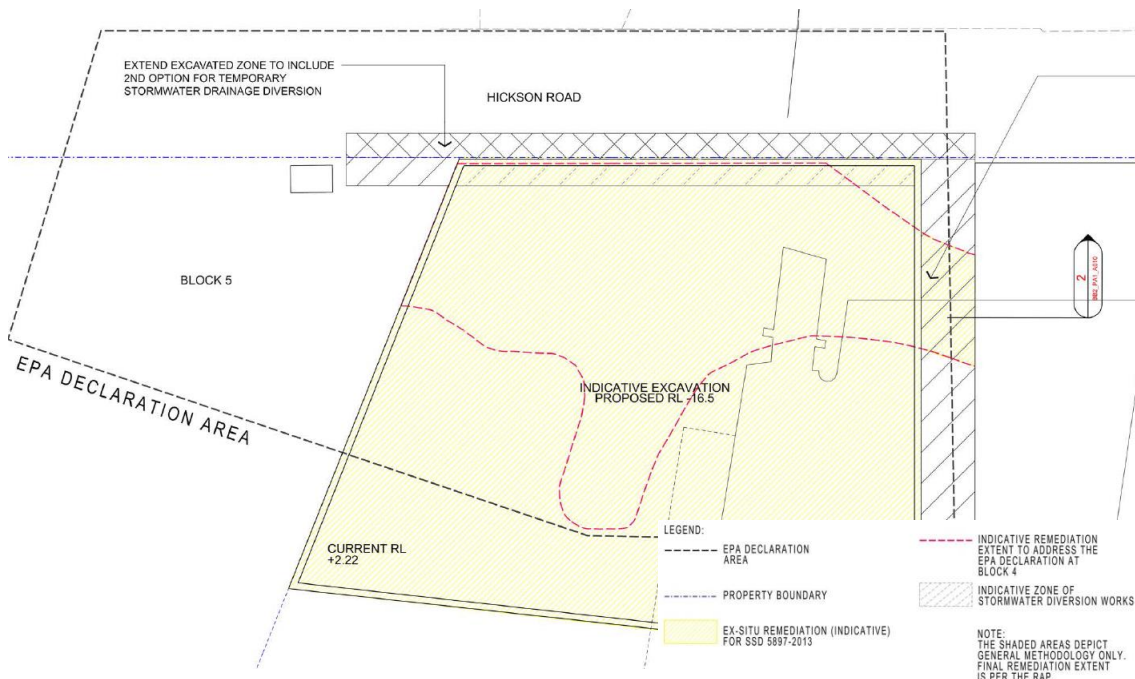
Proposed modified plan BB2\_PA1\_AA08 (Revision B, 19/9/2016)
